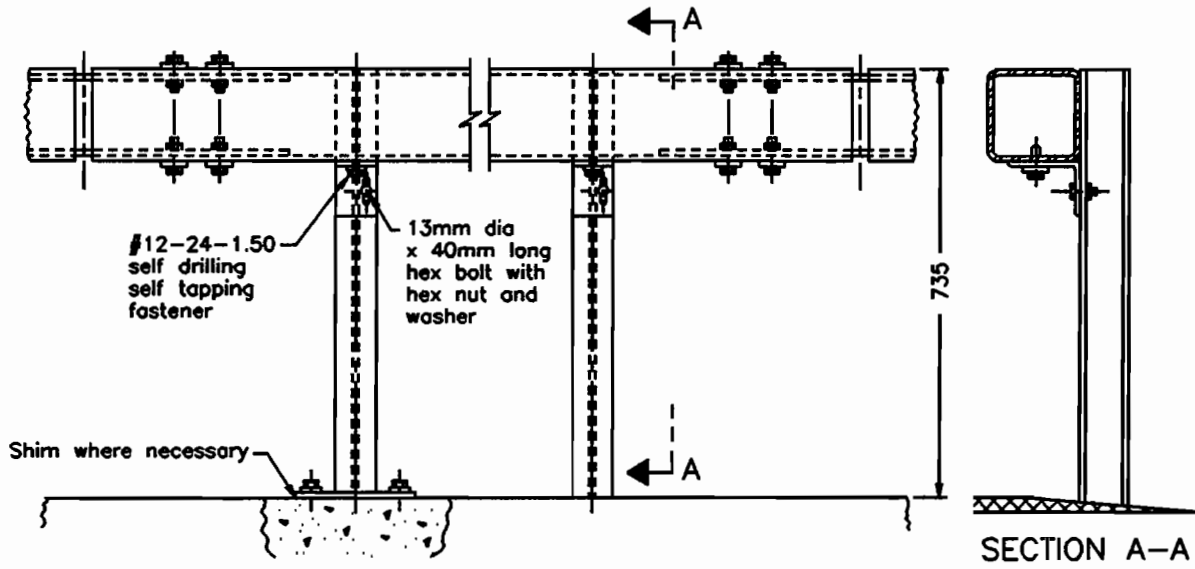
Box Beam Guide Rail Shoulder Installation (152.4 x 152.4 mm)
